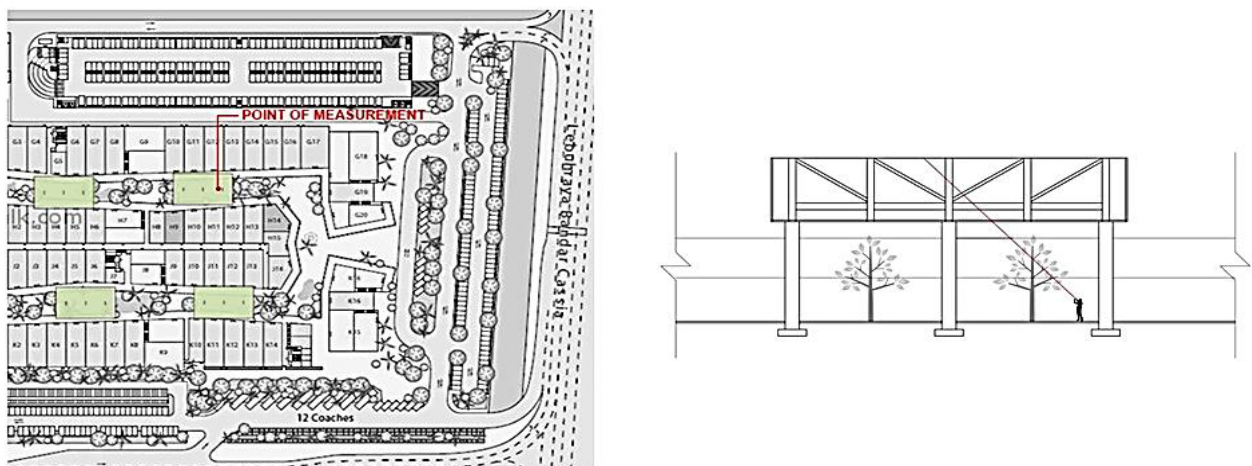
Design Village Point of Measurement Plan in Penang & Design Village Section for Point of Measurement in Penang.
